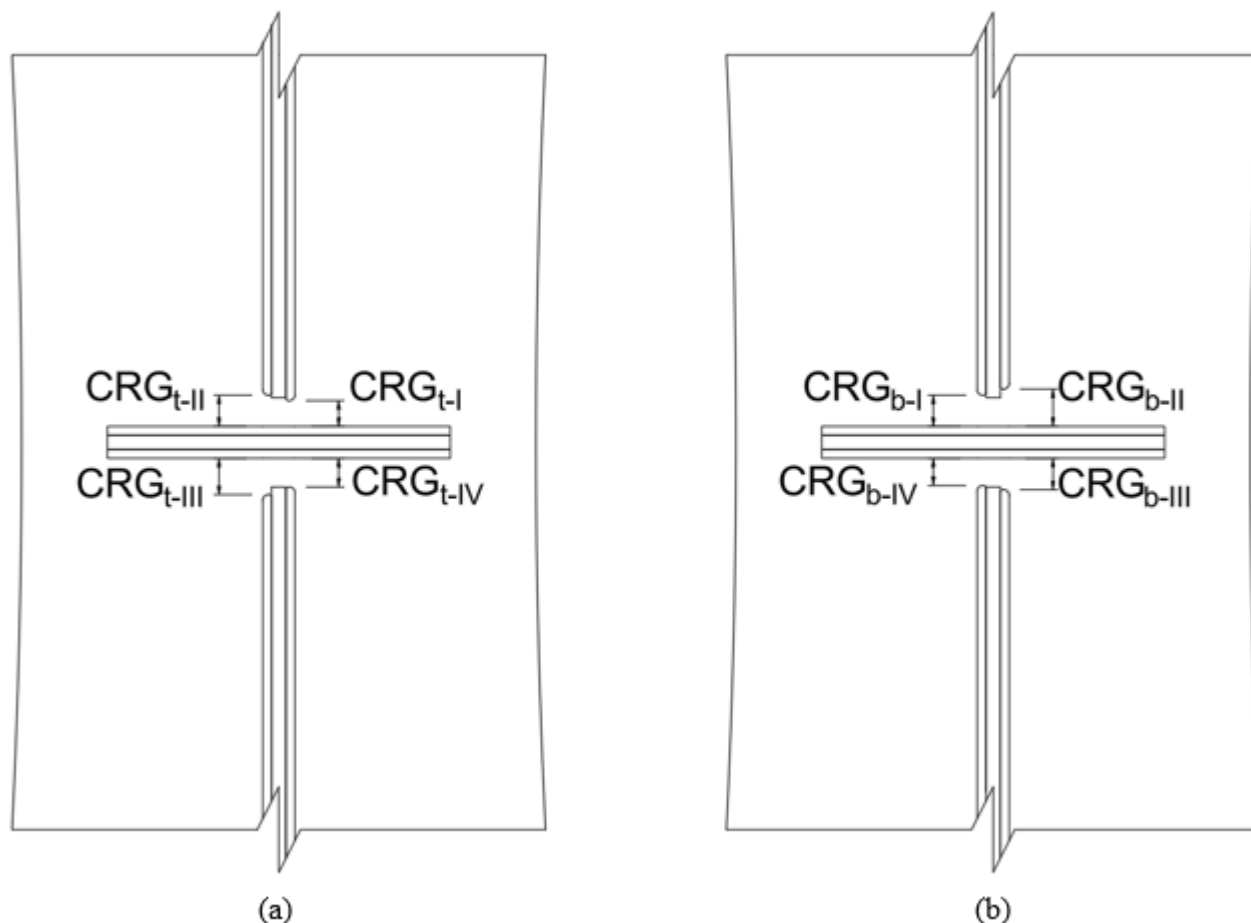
Illustration. Schematic representation of specimen weld termination dimensions from (a) top and (b) bottom surfaces of the specimens.
